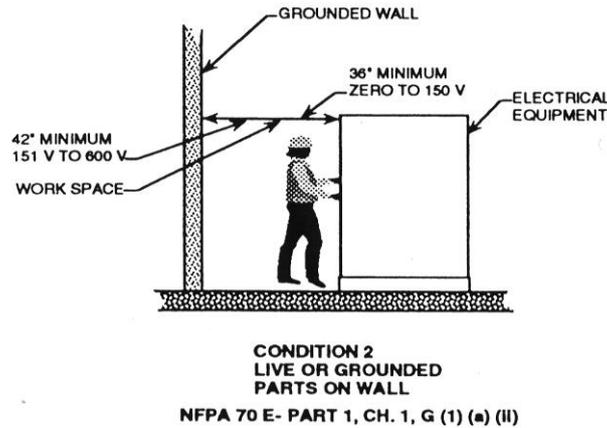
Clearance in front of electrical equipment with grounded wall opposite equipment.
